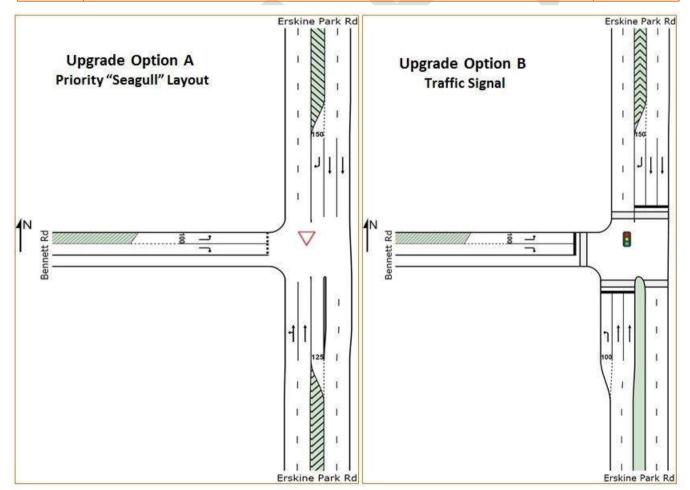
Preliminary Upgrade Option A and B modelled at Erskine Park Road/Bennett Road intersection
